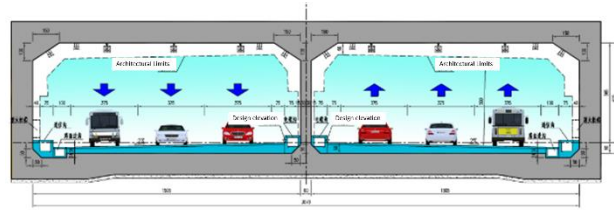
Architectural boundary and inner contour plan of the buried section of the tunnel (standard section)
